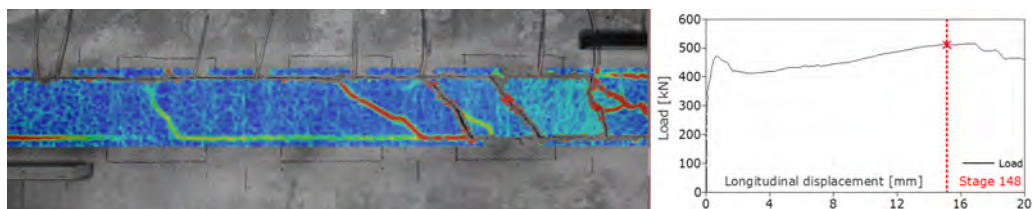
Cracks at a late stage of the test, Specimen III2, '2-on-2' loop configuration
